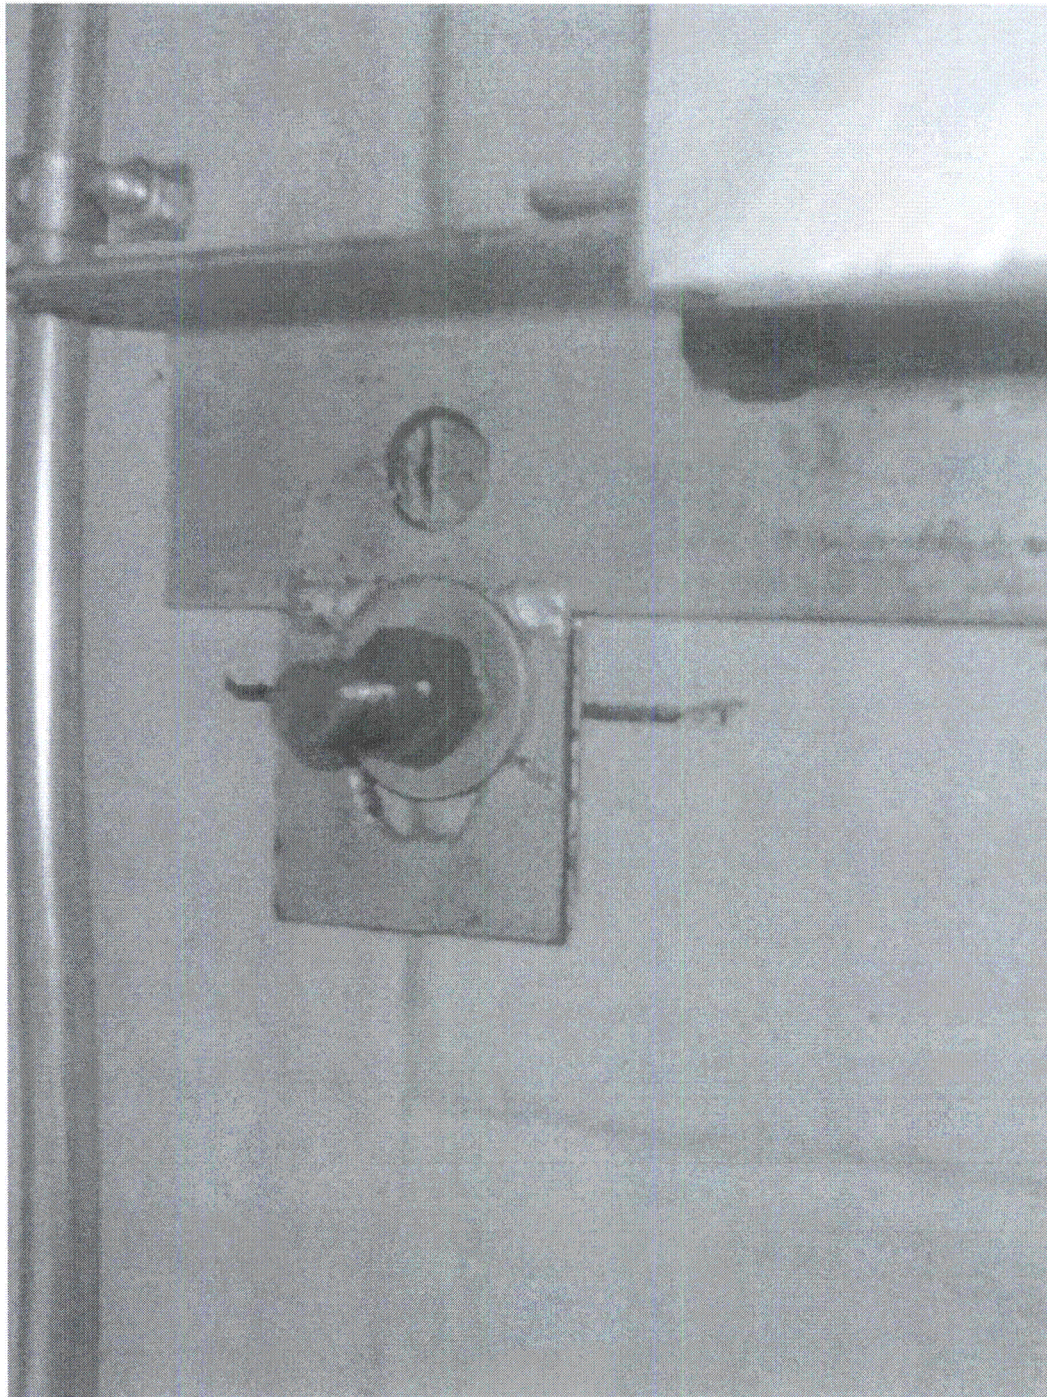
Reduced Anchor Bolt Spacing (Room C-027)
